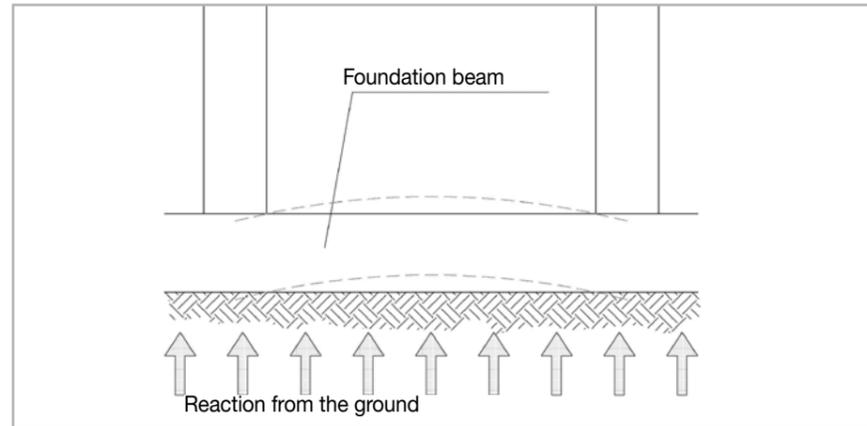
Schematic diagram of stresses acting on a foundation beam
